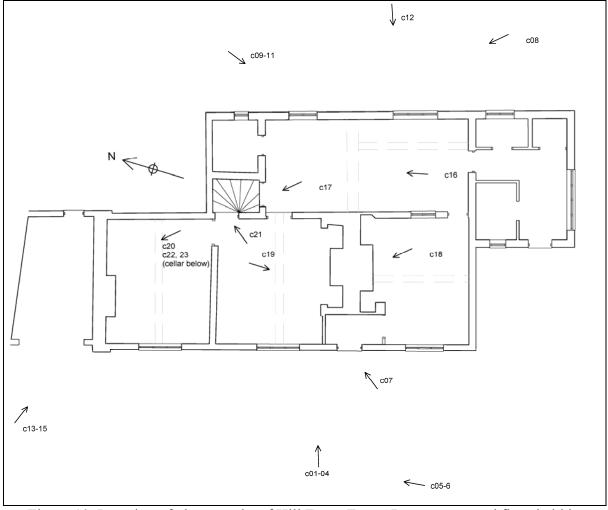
Location of photographs of Hill Farm, Fenny Drayton, ground floor held in archive
